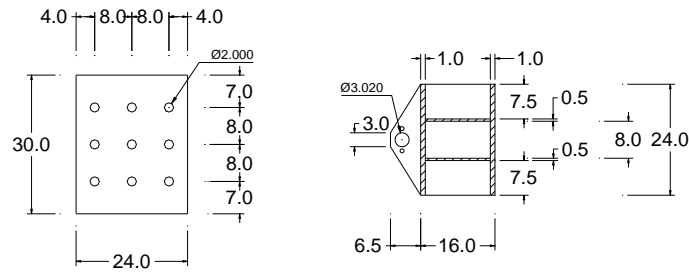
Cross sections of the concrete beam (left) and steel beam (right)
